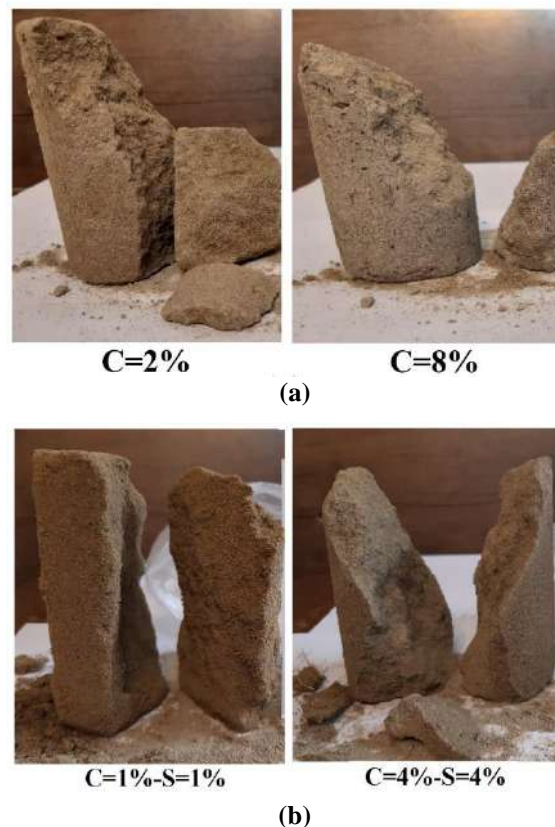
Failure patterns of the: a) Specimens treated with cement; and b) specimens treated with cement and steel slag mixture
